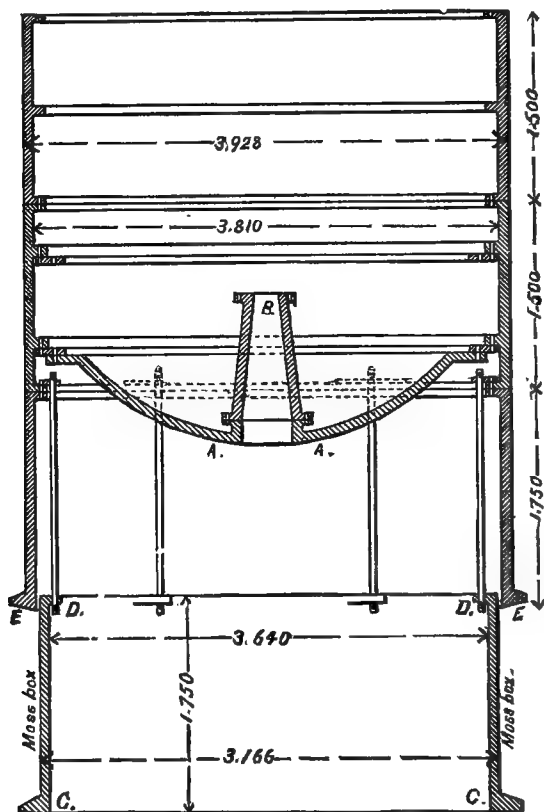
False bottom, moss box, etc., for the lower end of the tubbing column of the Kind-Chaudron process. Dimensions are in meters.
